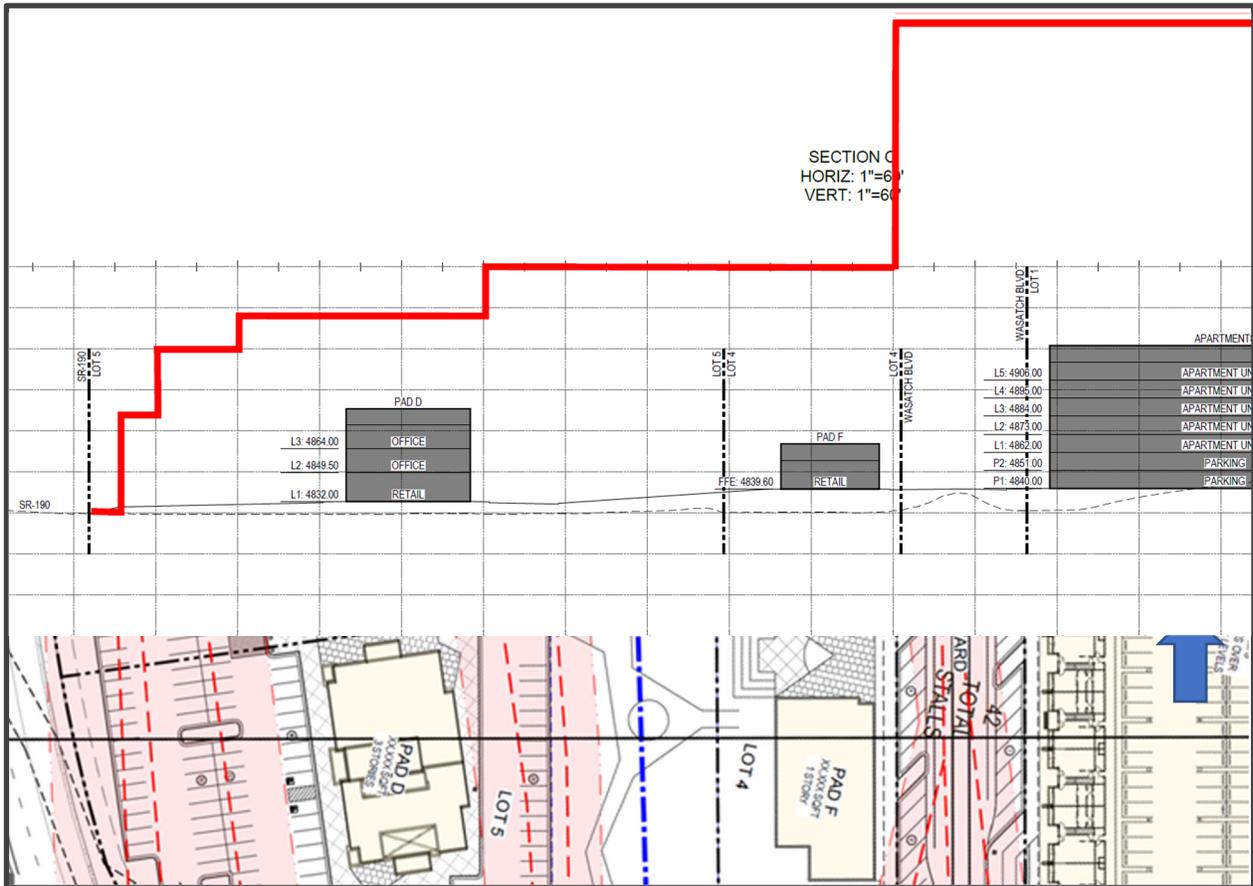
SOUTH BUILDINGS - HEIGHT CROSS SECTION (RED MAXIMUM HEIGHT PERMITTED)
